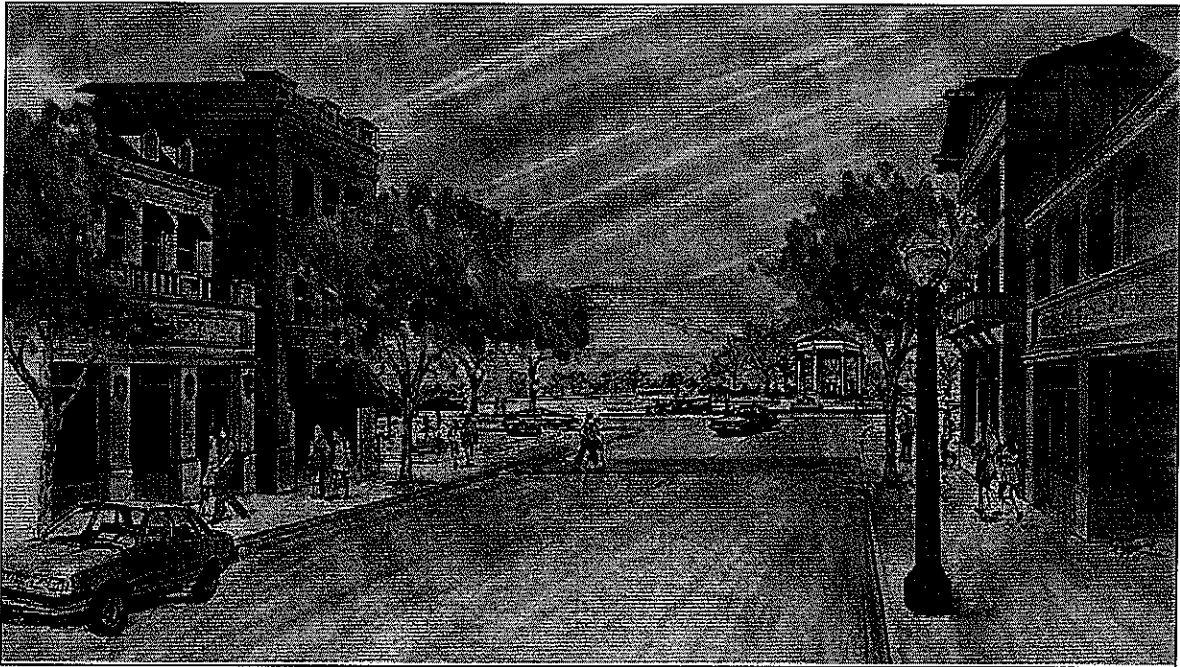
A: View looking Southeast from "A" Street toward Righetti Hill, across the neighborhood park area.
